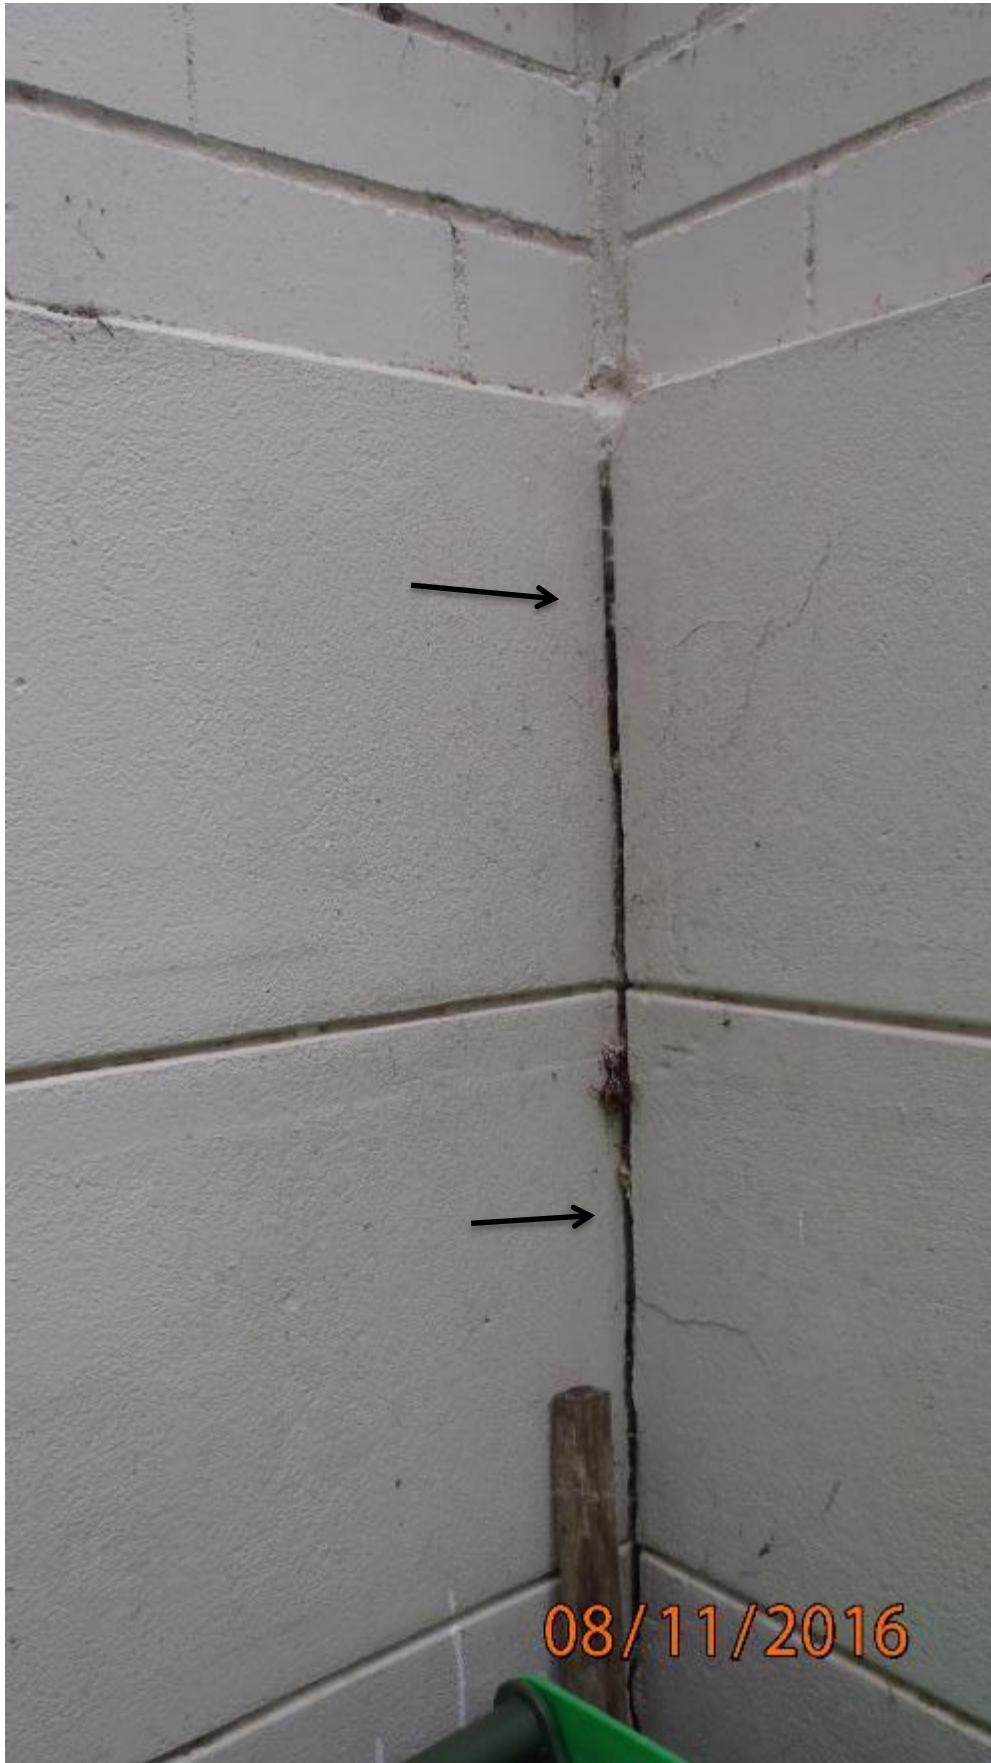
shows cracking around the expansion joint in the brickwork outside the kitchen.
